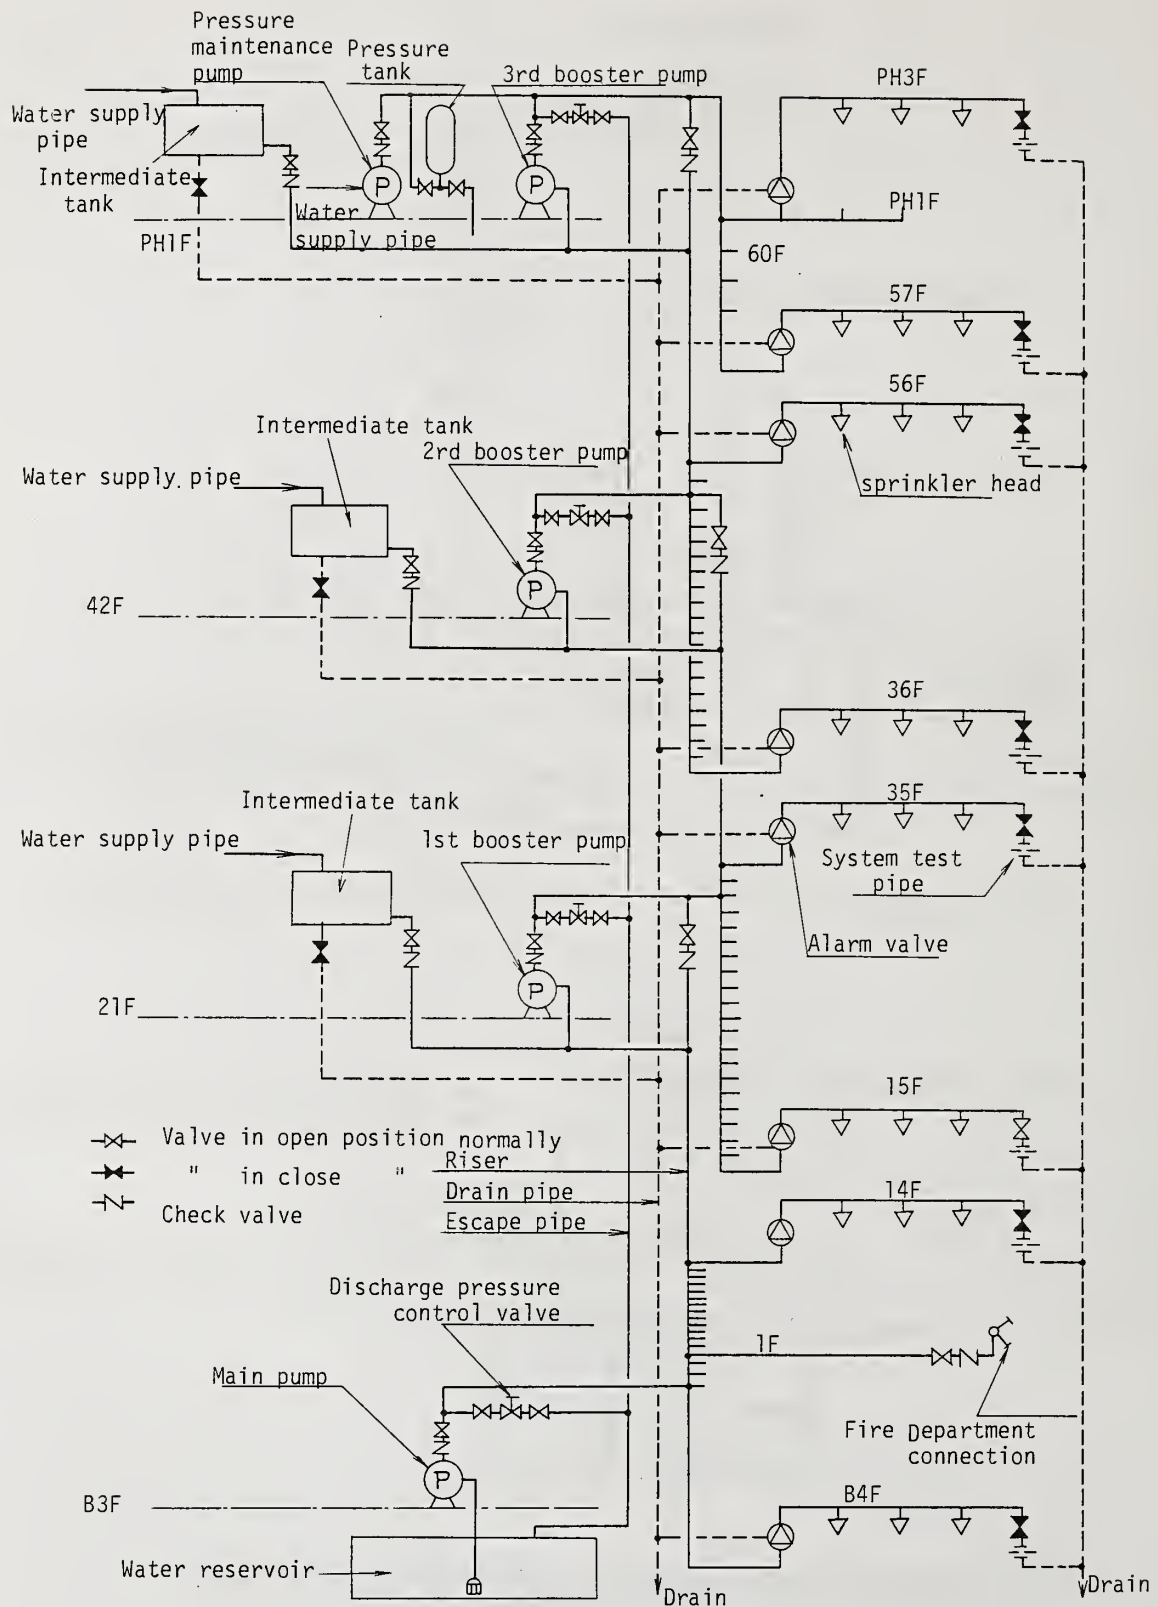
Water supply arrangement for sprinkler system in high-rise building
